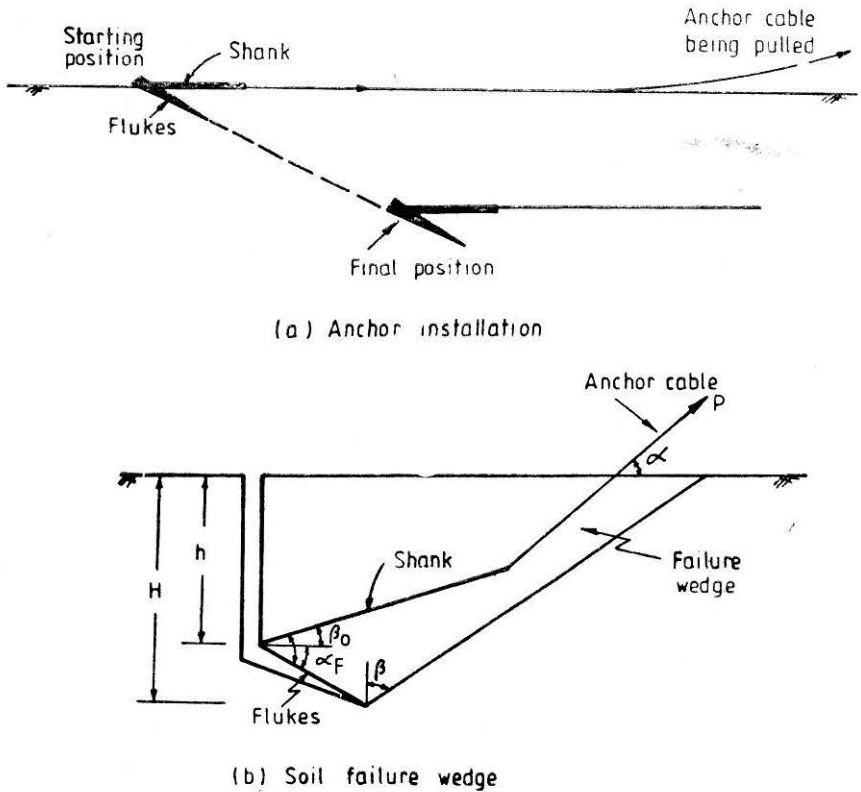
Anchor with Flukes : Installation and Soil Failure Wedge
